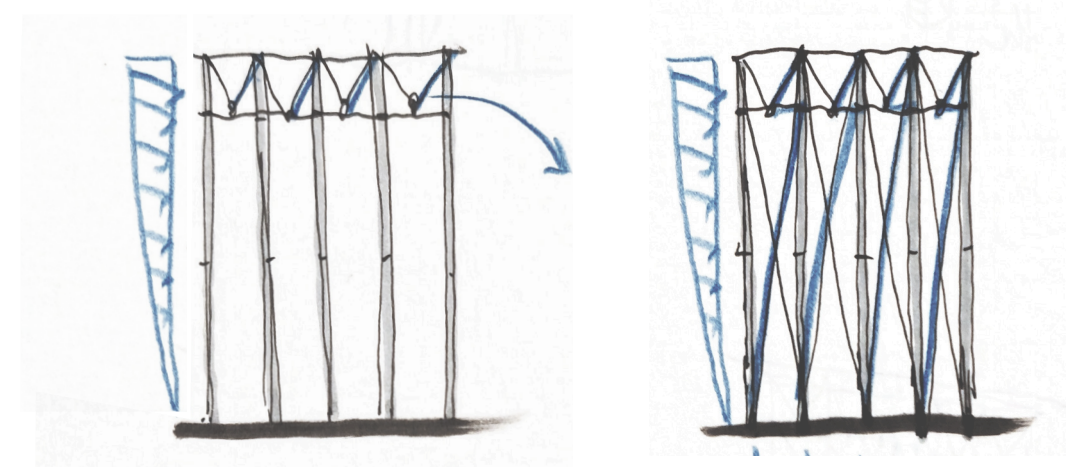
Horizontal loads. 3D truss for high horizontal stability and wires to transfer forces and give further stability.
